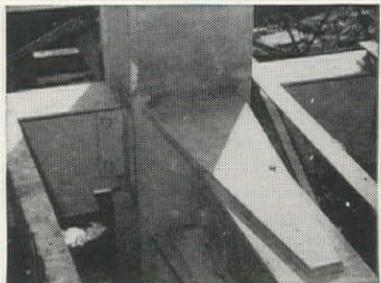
Simpler Detail Speeds Erection. Clip angle is shop welded to column for bolting beam in the field. Outside cover plates are then field welded to top and bottom flanges and the top plate to column in flat position with Lincoln "Fleetweld 5" electrodes. Bottom plate is shop welded.
